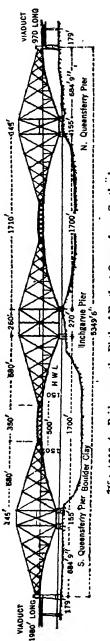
A Bridge over the Firth of Forth at Queensferry, Scotland.
